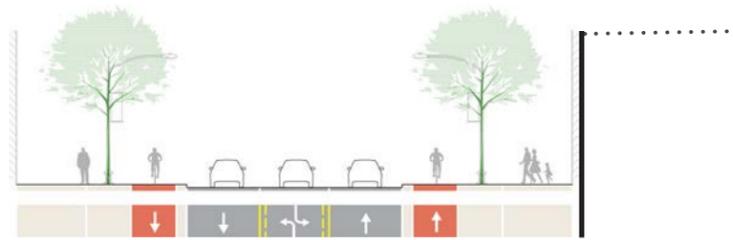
12th Street typical section West Avenue to Lamar Boulevard
